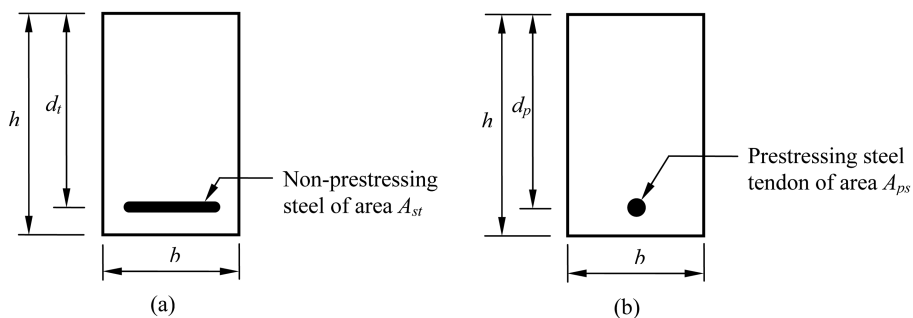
Sections analyzed (a) reinforced concrete section and (b) prestressed concrete section
